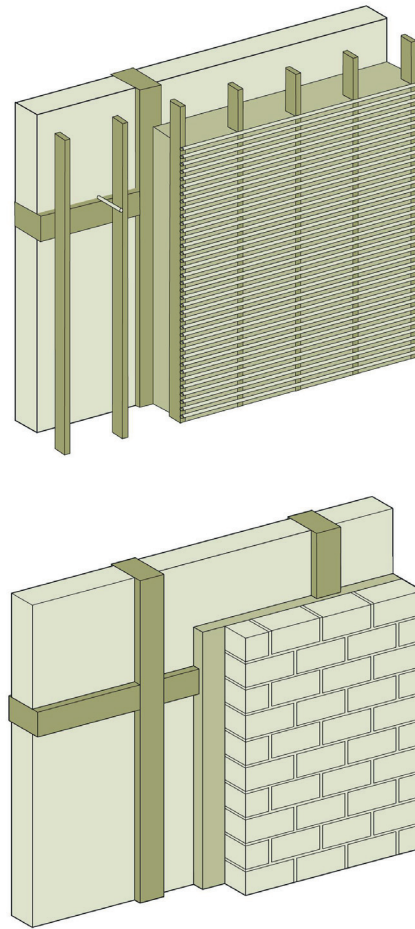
Light earth internal wall lining methods. a) as a moist malleable mass, and b) as internal masonry layer
